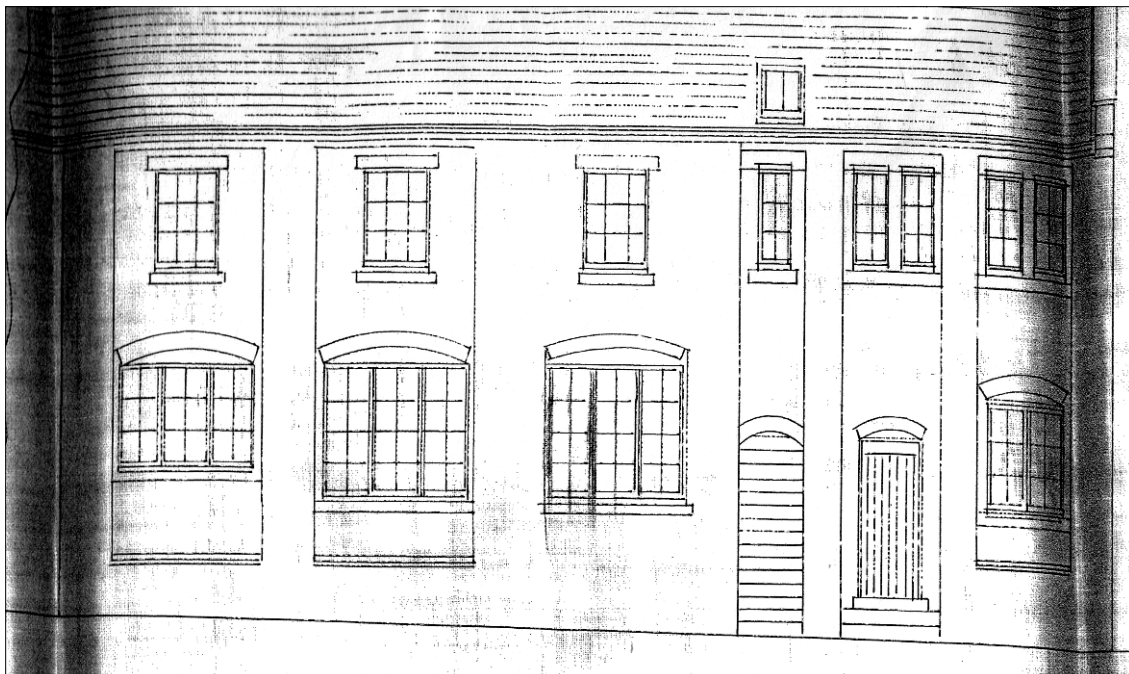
Building A with B to the right (south elevation). The Slip House lies to the left of the stairs (source: Worcester City Planning Application 1437 23.1.1890).
